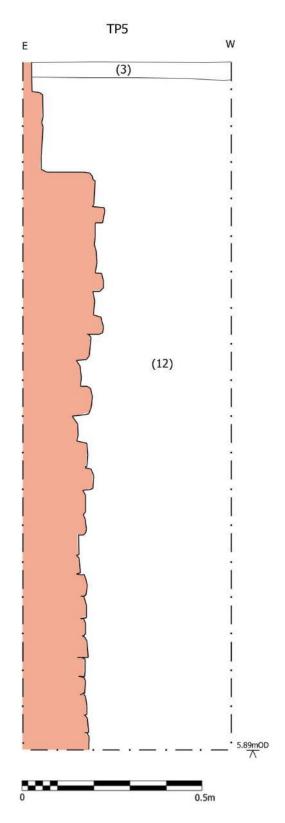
N facing section of TP5, with party wall foundation shown in red. Original drawn at 1:10.
